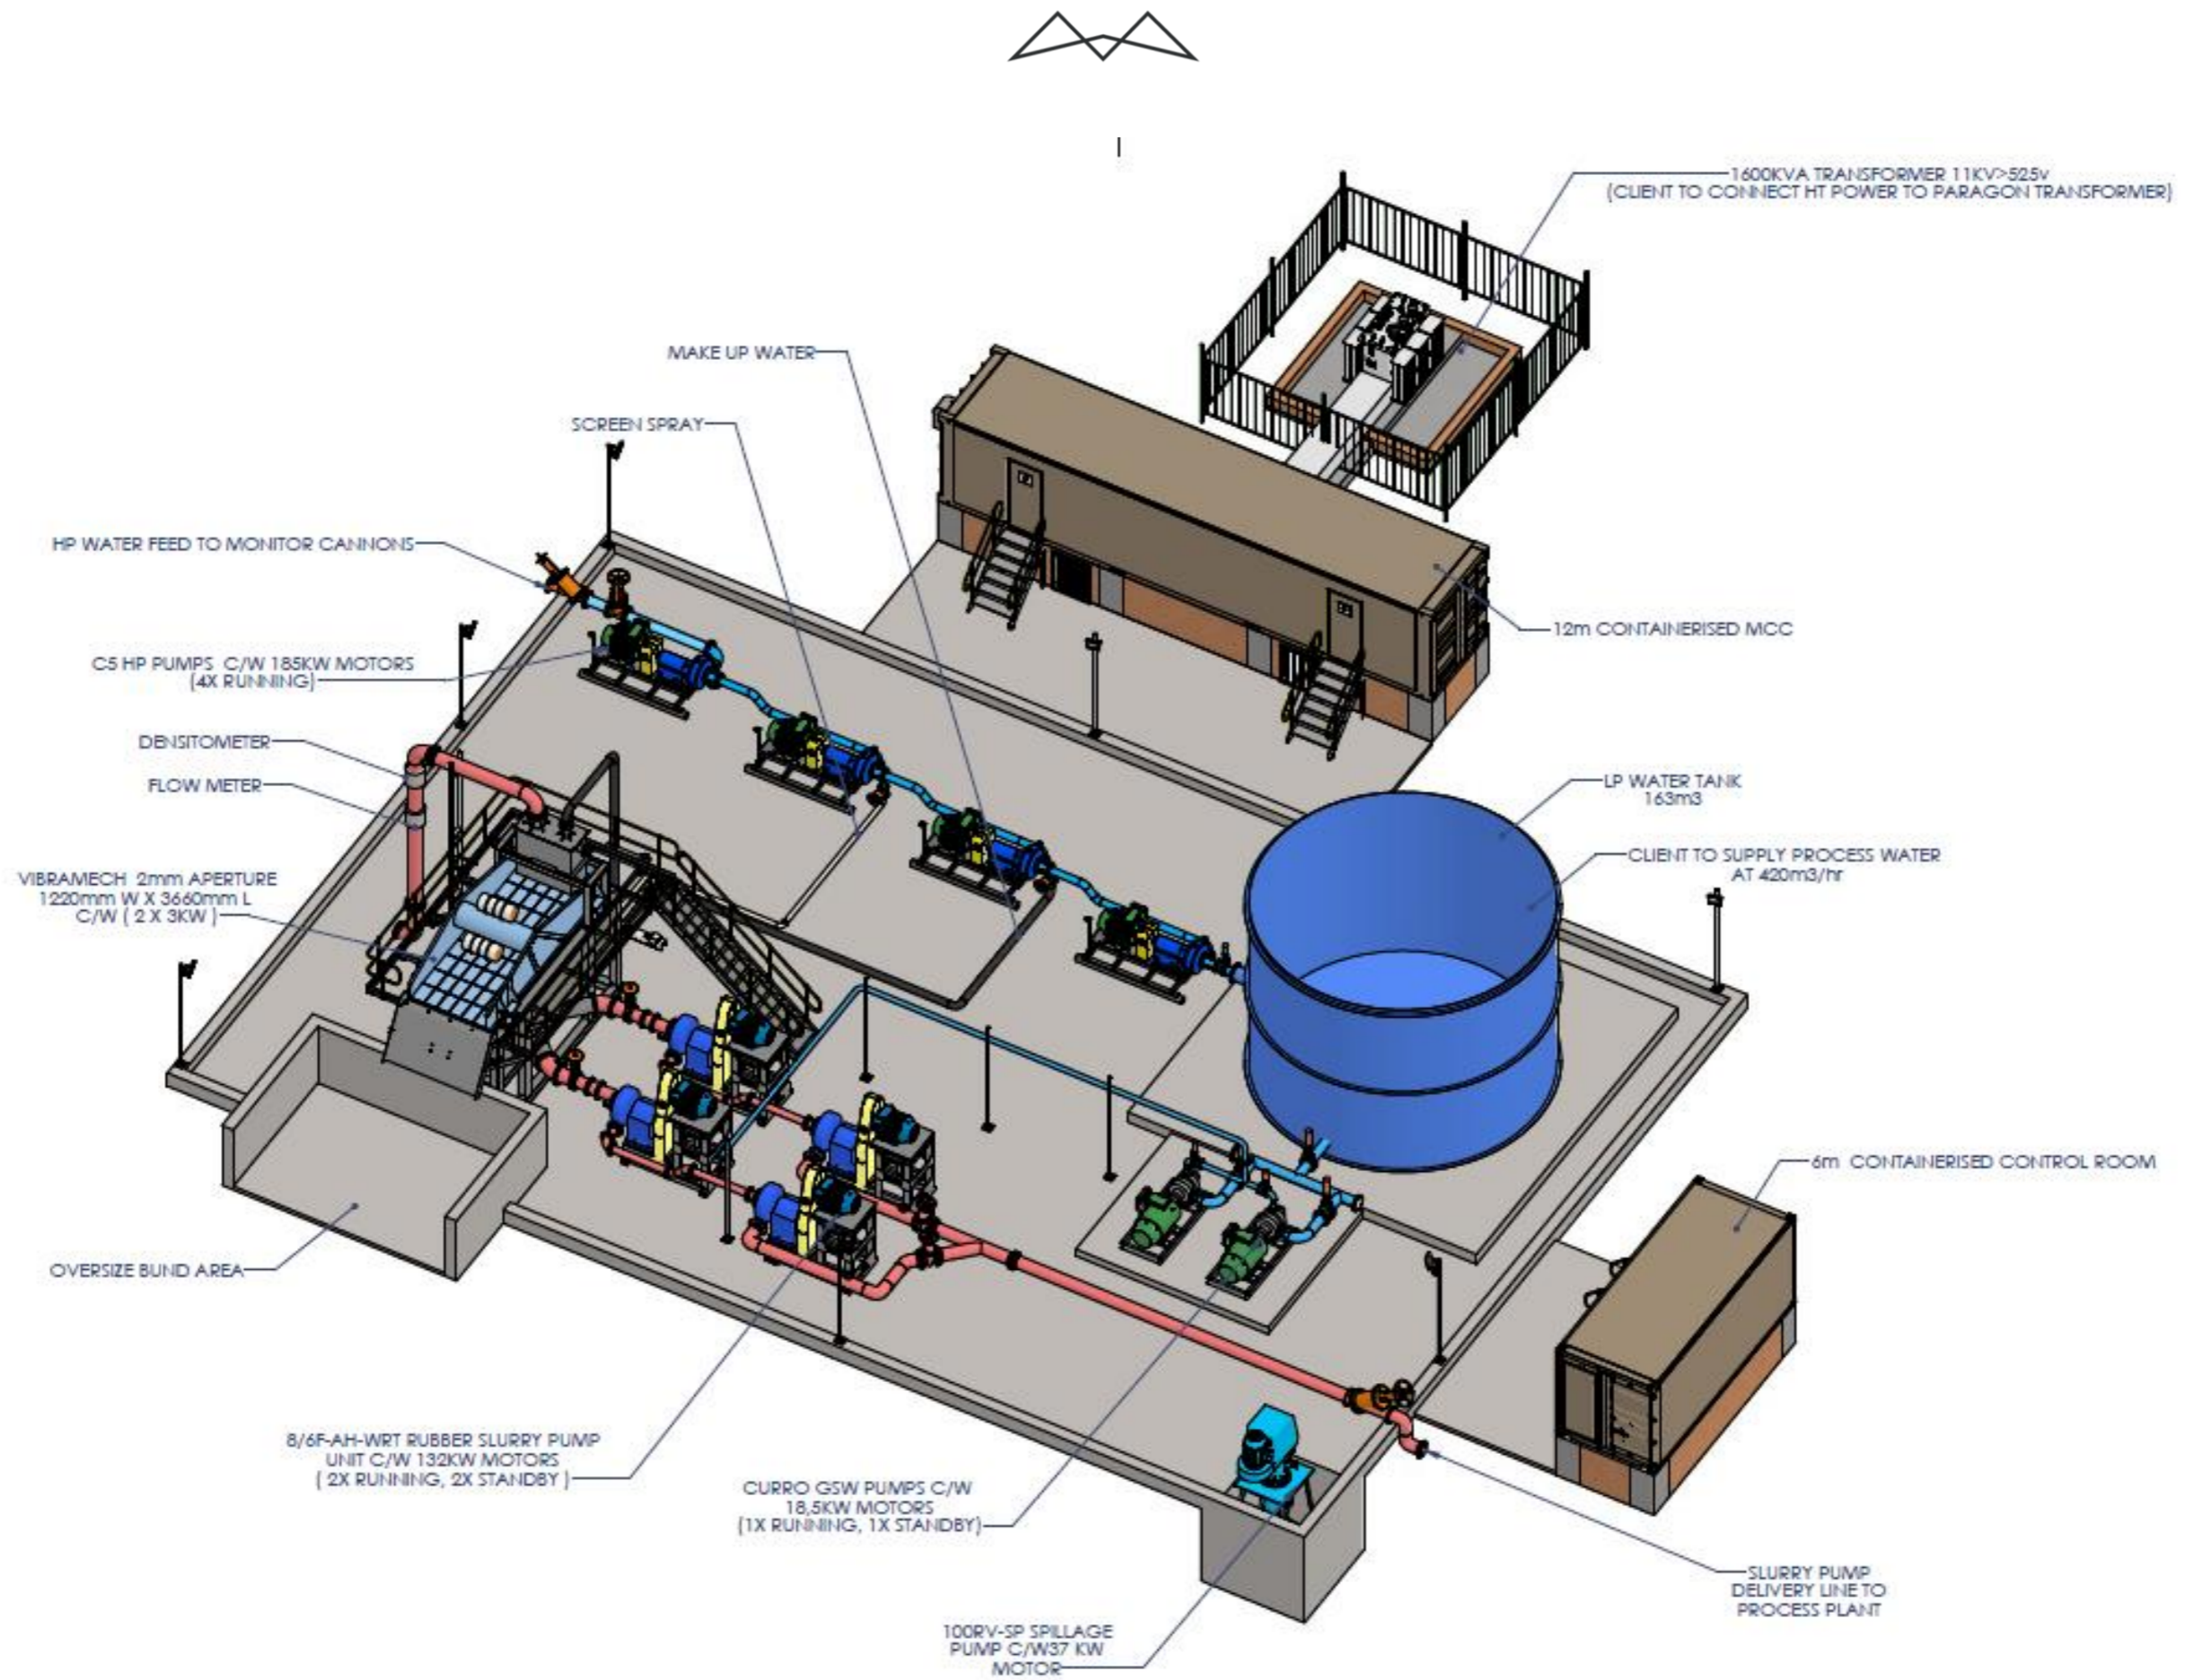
Preliminary 3D layout model of the proposed hydro mining pumping and screening plant (Sibanye Stillwater, 2023).
